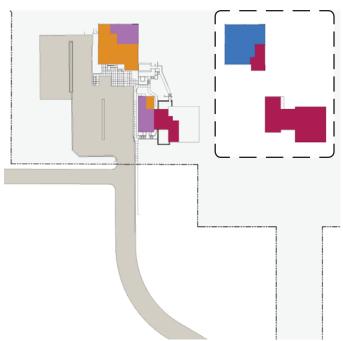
Ketchikan Upper Campus Building Use (Level 2 shown in dashed frame)
